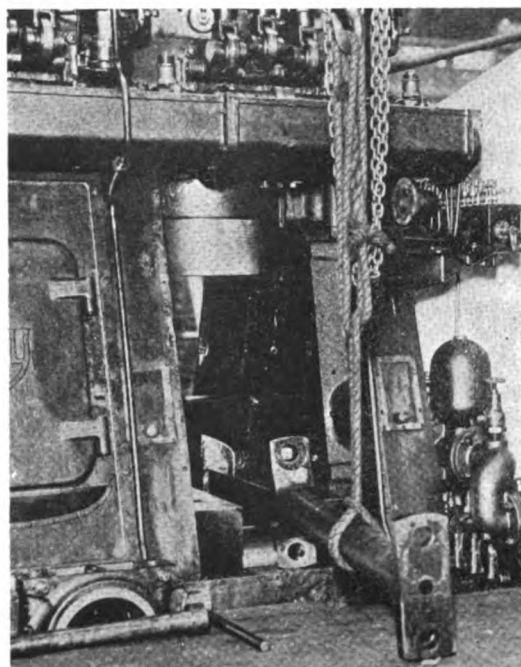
After the lower-end bearing is taken off the crank pin the upper end may be reached and disconnected.
